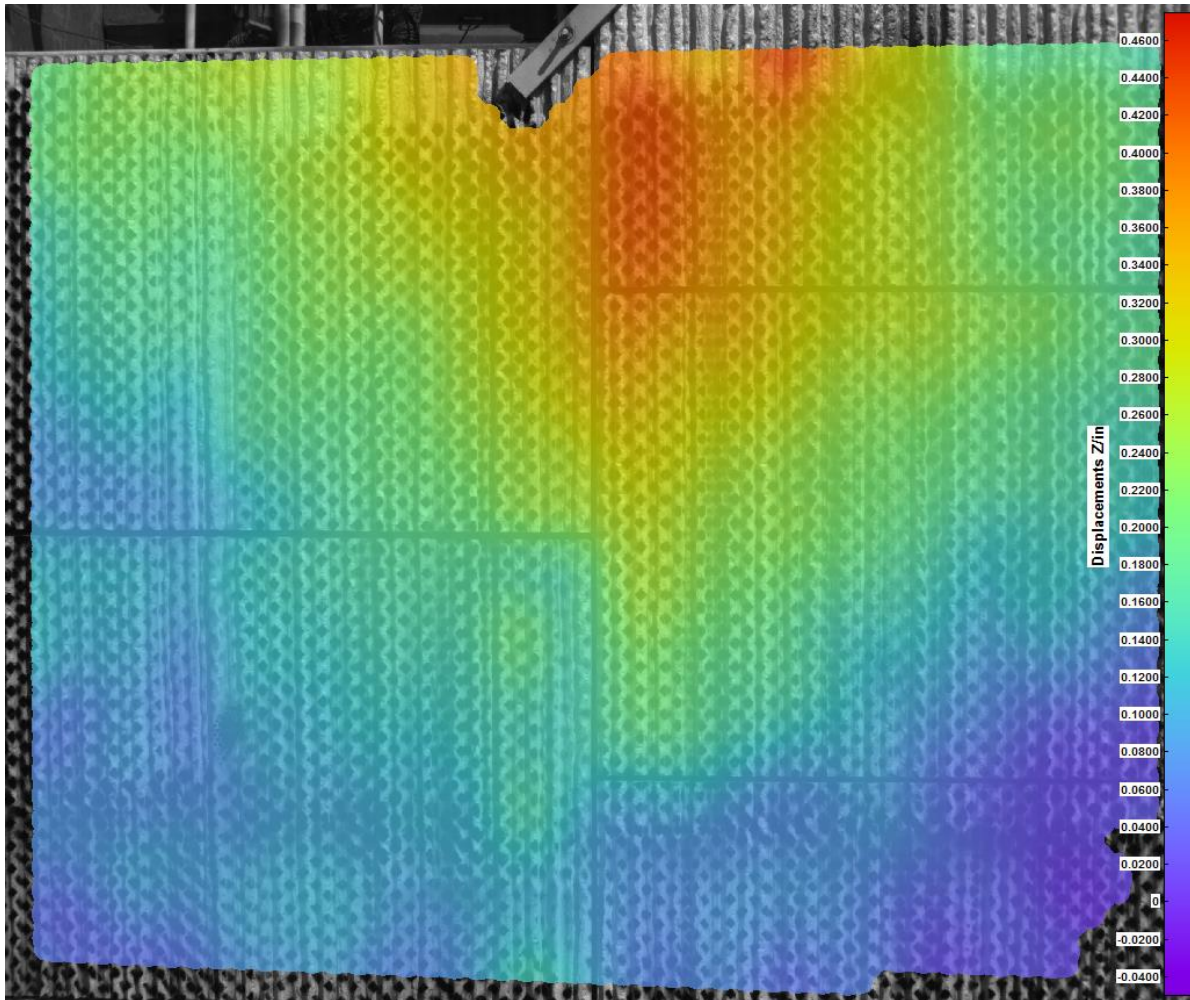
Sample processed photo of the wall from DIC, 3 inch pile head displacement, 4.3D test.
